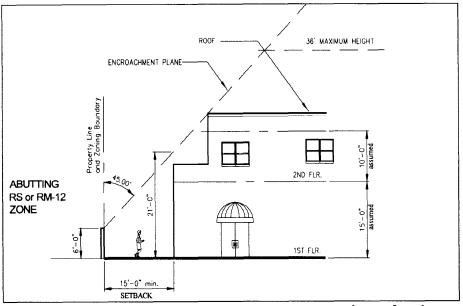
Encroachment plane requirements for projects abutting RS and RM-12 districts
